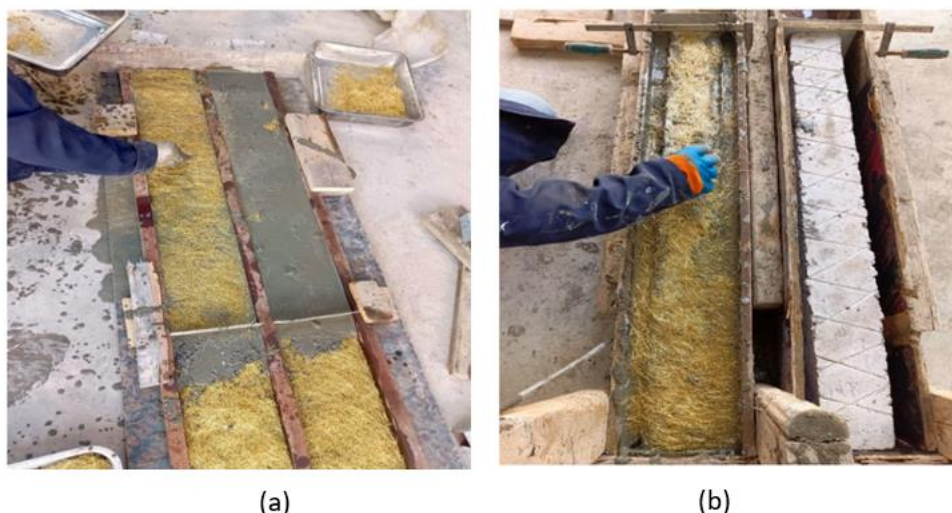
Beam specimens (a) fresh SIFCON (b) hard SIFCON
